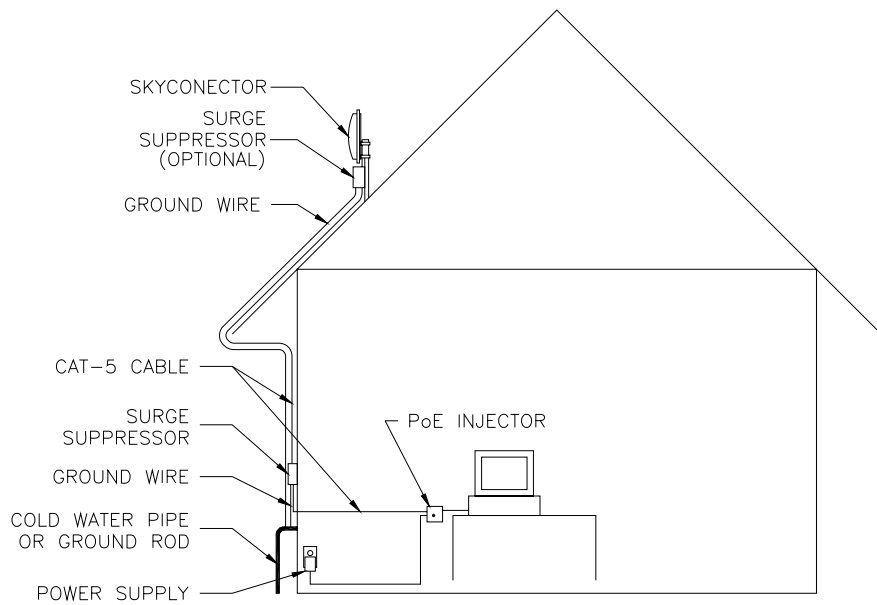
Insuring proper grounding to cold water pipe or ground rod
